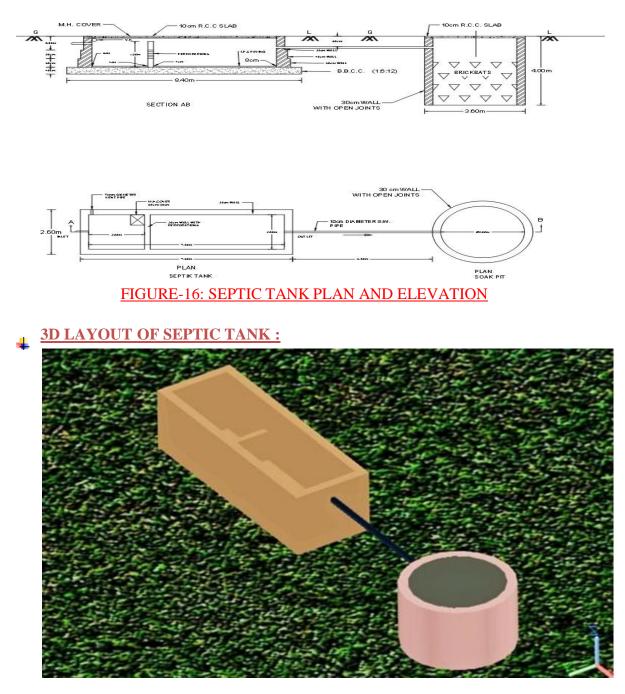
3D LAYOUTS OF SEPTIC TANK
